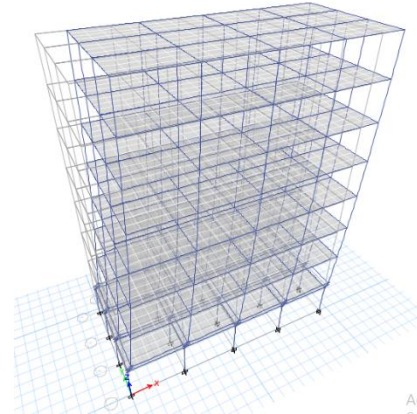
Deformed shape of Building Structure A model with isolations on the 1st story
